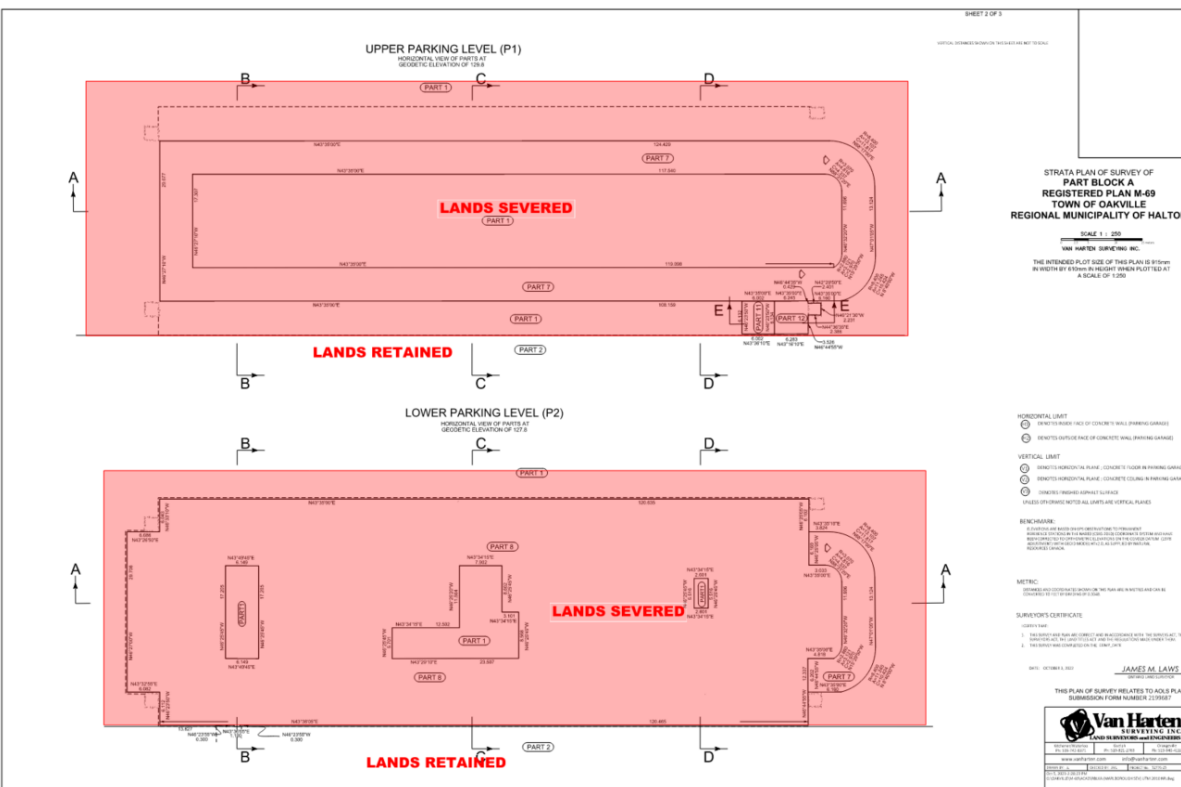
Strata Plan of Survey (Sheet 3 of 3)
